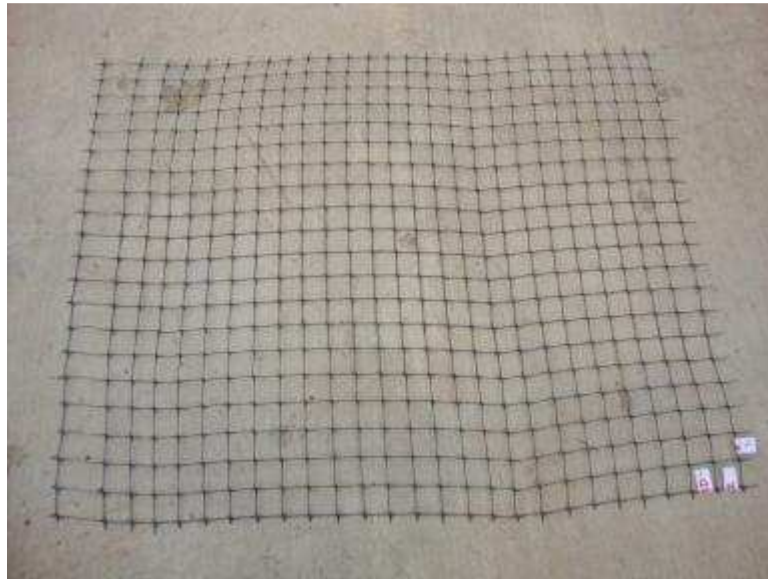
EGG2 geogrid specimen (single layer) prepared for installation damage tests
